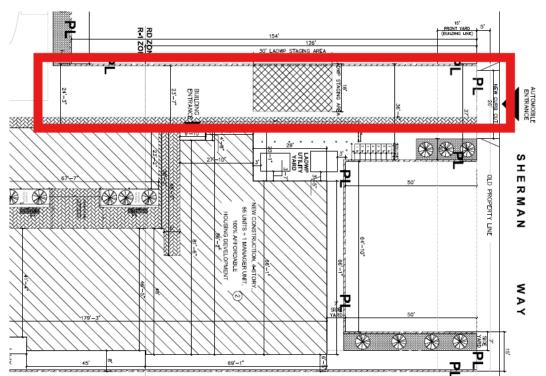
The access driveway for the property from Sherman Way does not abut any single dwelling units
